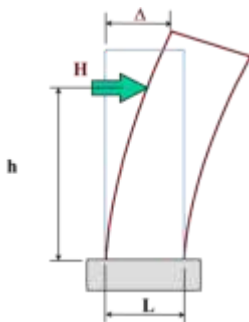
Lateral Stiffness of Shear wall Advantages of shear wall:
